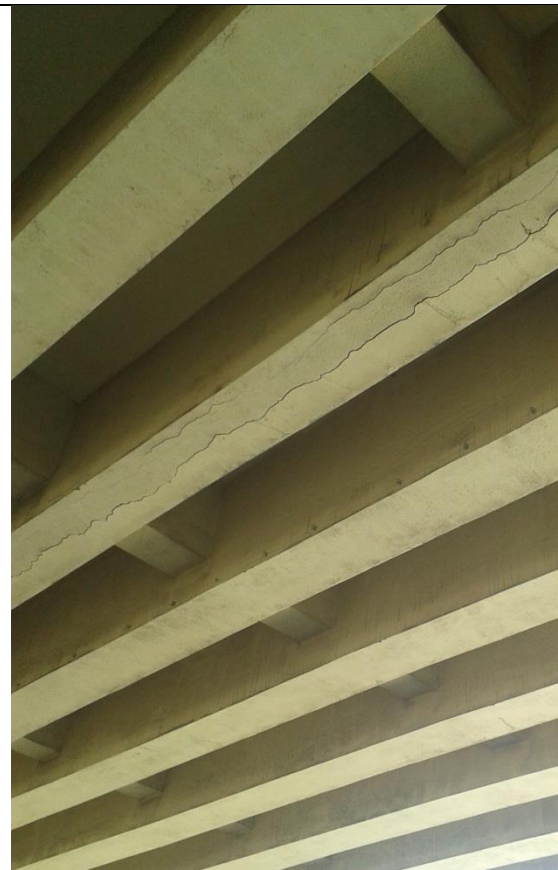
Longitudinal and transverse cracks in longitudinal beams
